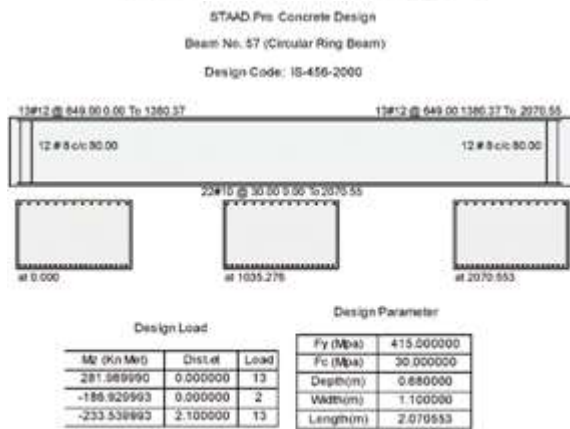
Reinforcement details of beam No 57 (Tank with full water in Seismic Zone III)
